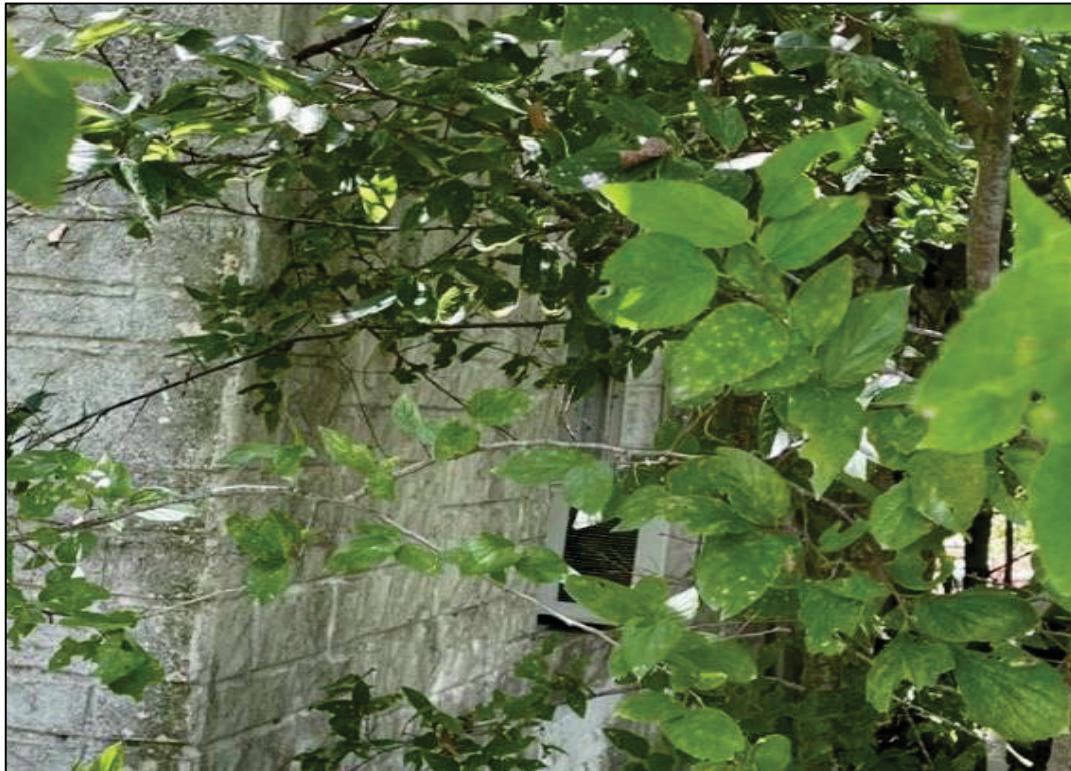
View of the Southwest Elevation of AR 5, facing South.
